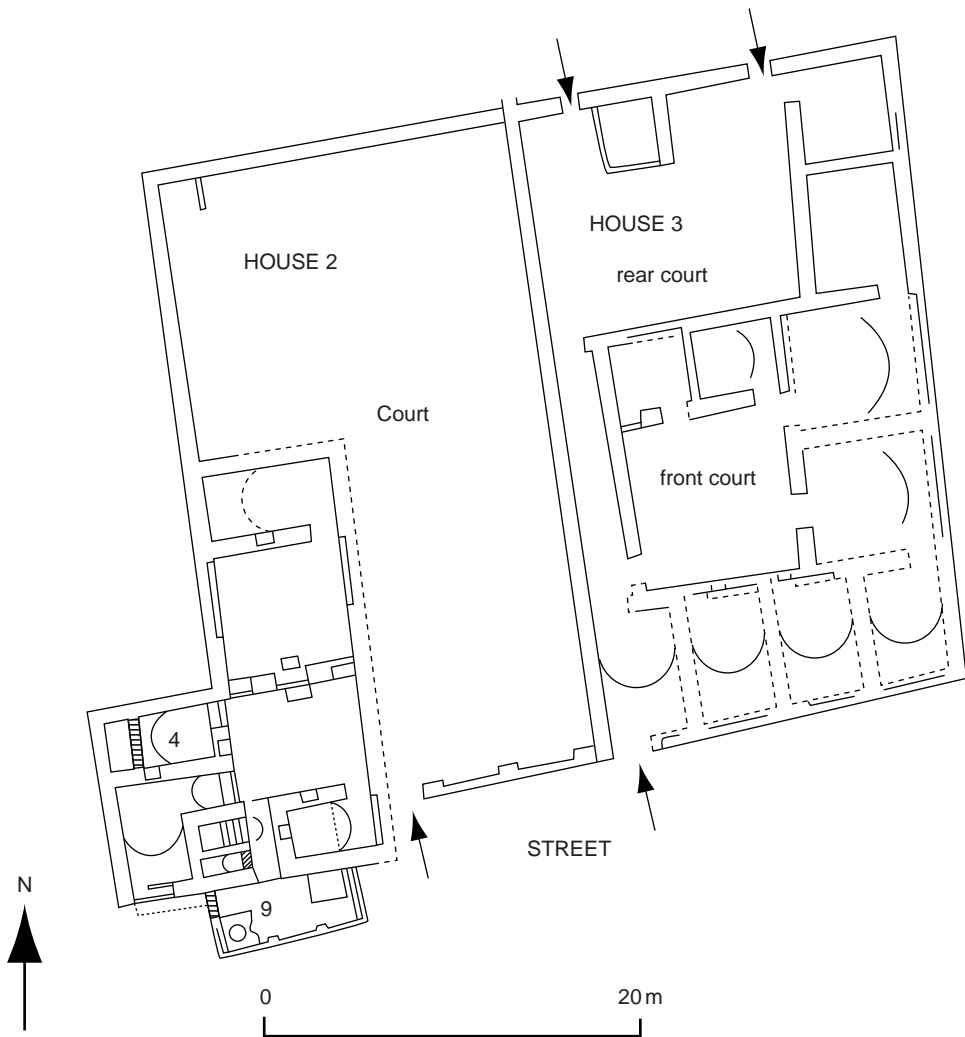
Plan of houses 2 and 3, Kellis; plan redrawn based on Hope (1987) fig. 2.
